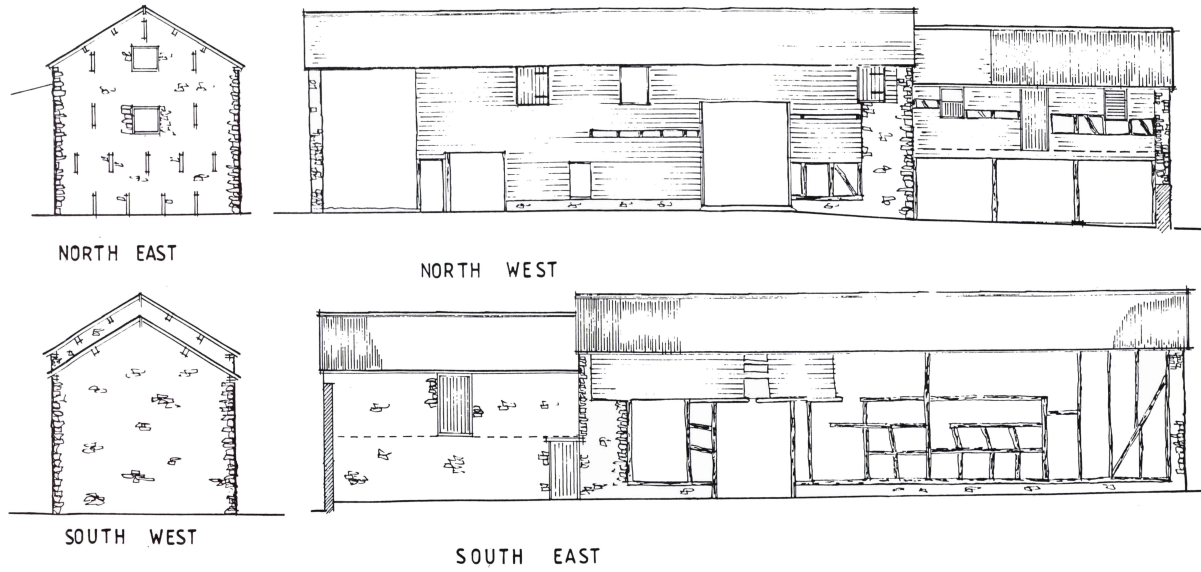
Architects Drawings of current elevations. By McCartneys Surveyors & Planning Consultants 2005.
